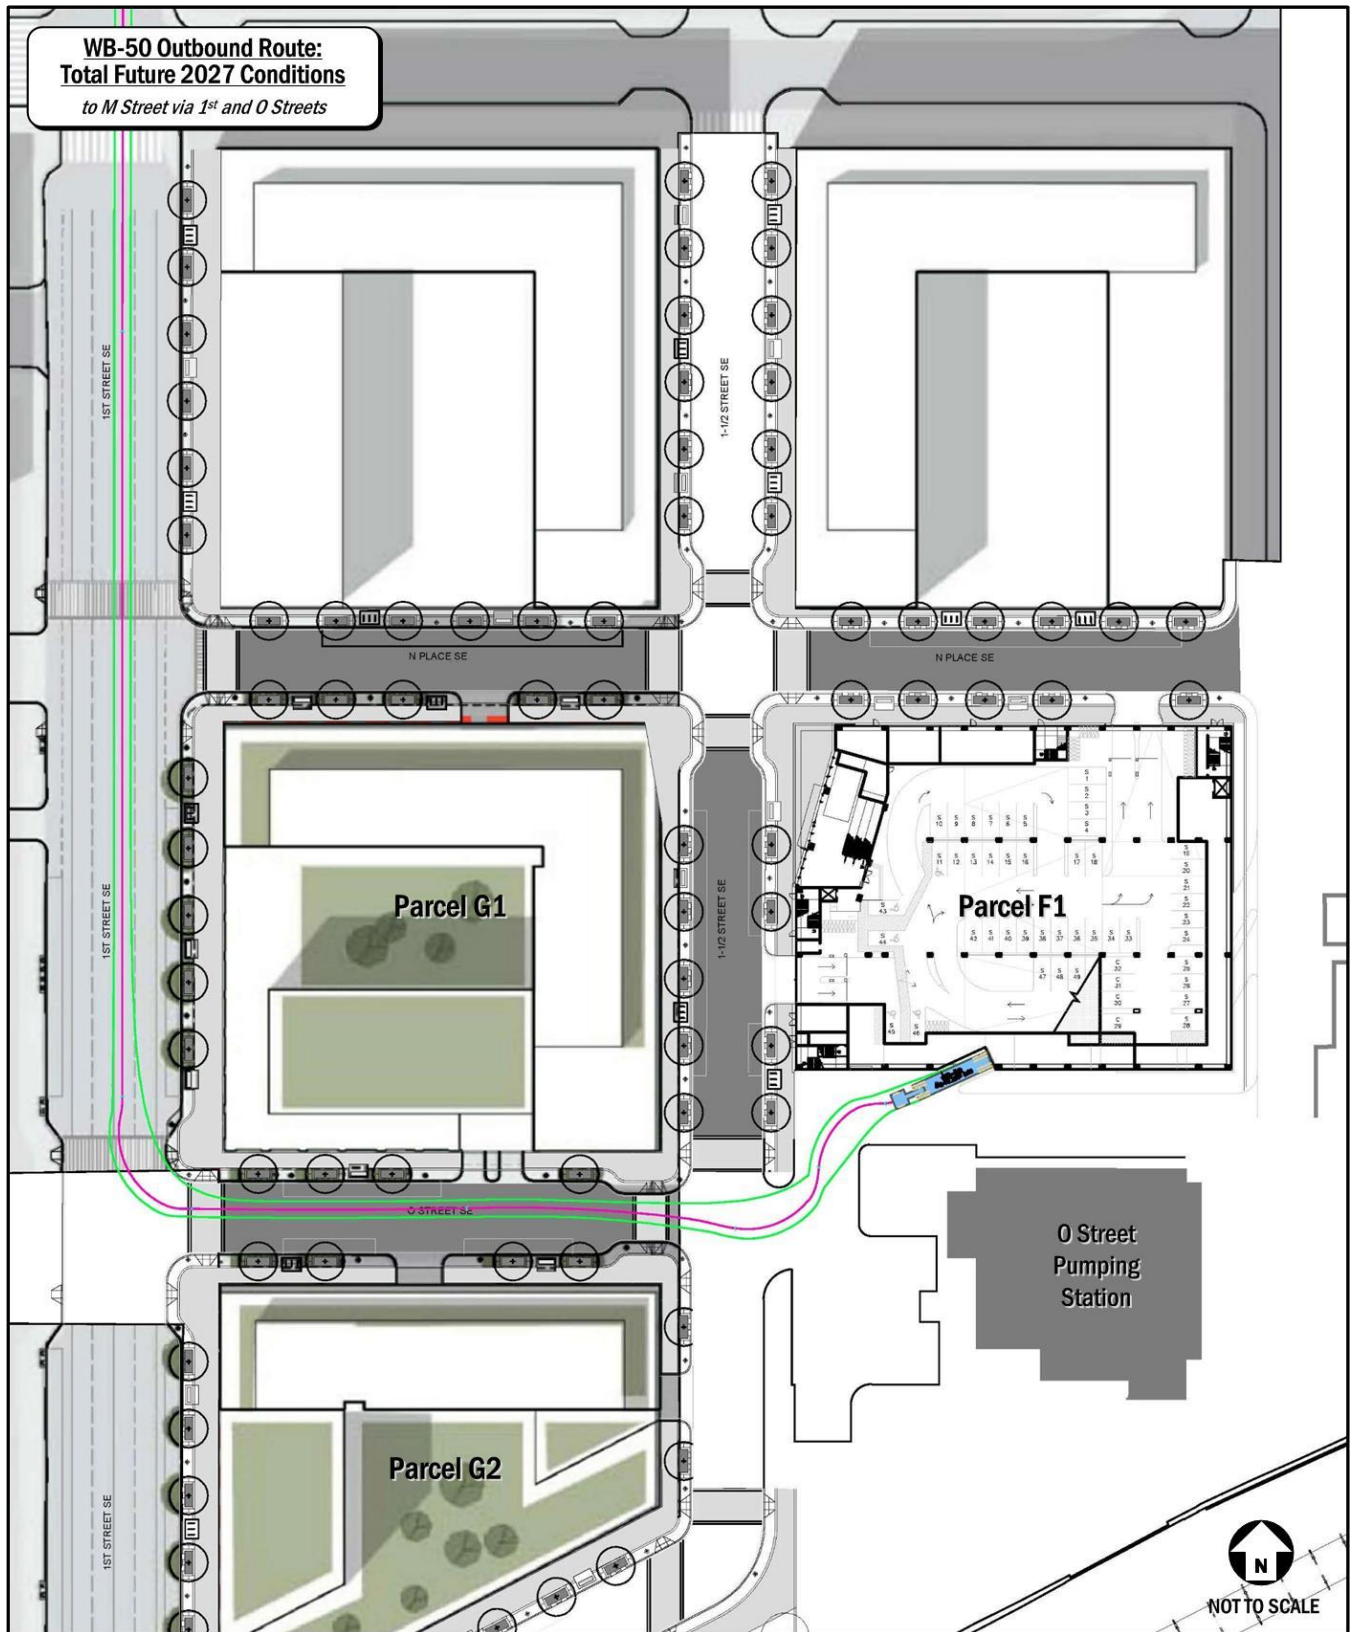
Outbound Truck Turning Diagram (with O Street at Full Buildout)
